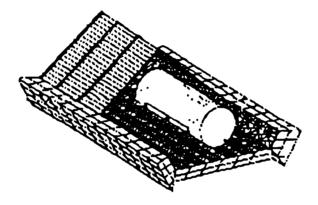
Boeing LSS Construction/Storage/Hanger Facility
